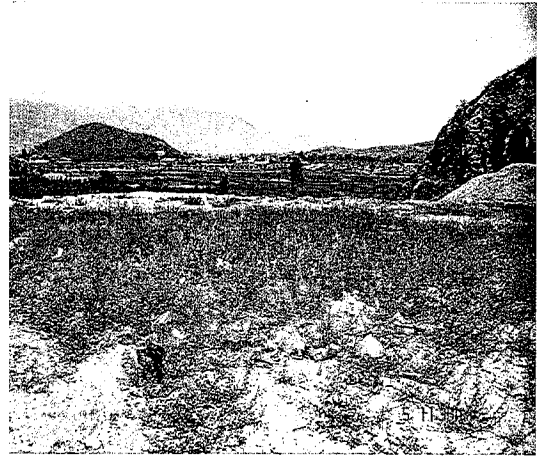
The protection skeleton for the borrow pit ground and excavated surface on the back of Dali Station is under construction
